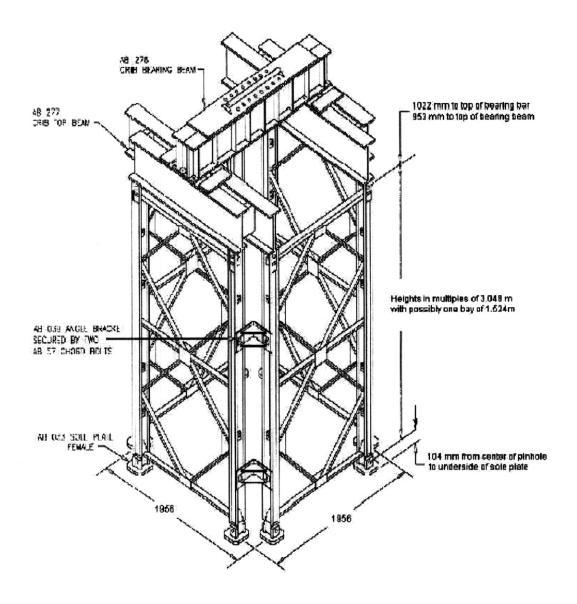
TOWER OUT OF ACROW PANELS [1]
